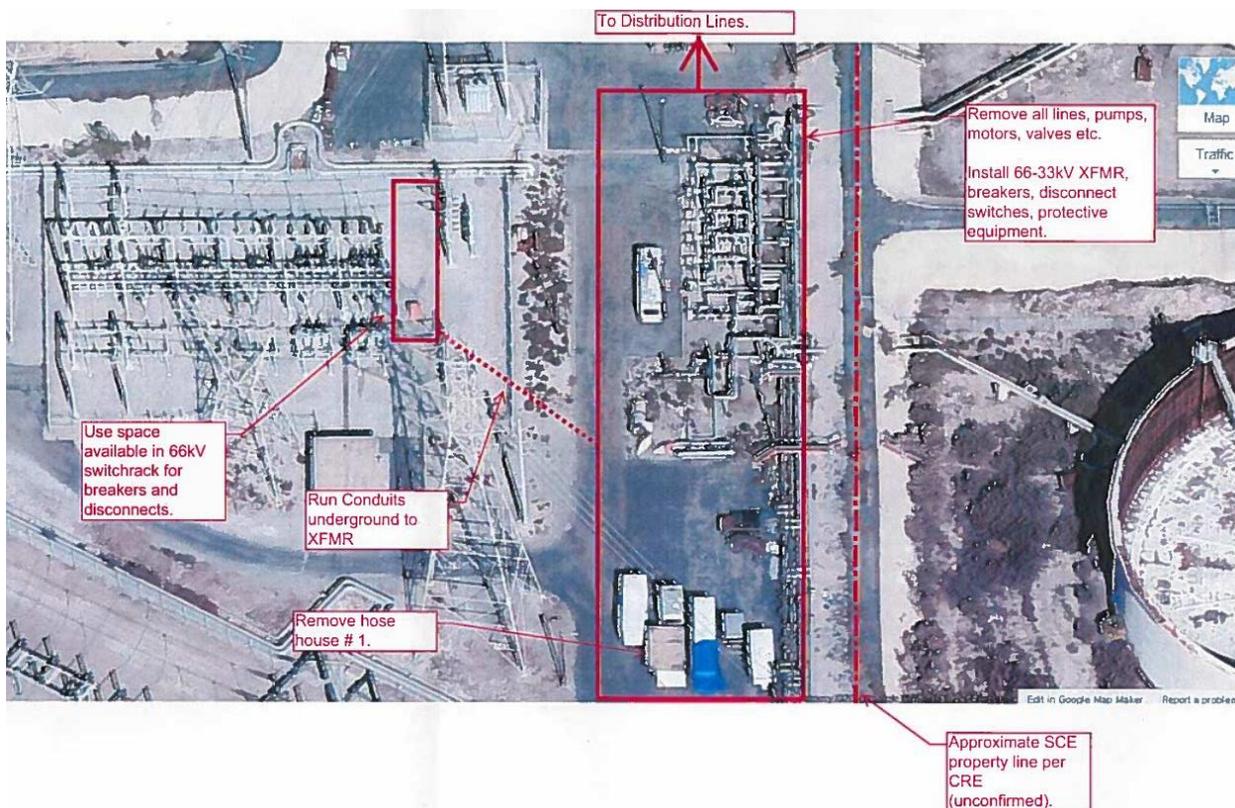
Huntington Beach 66-33kV Substation Conceptual Layout
